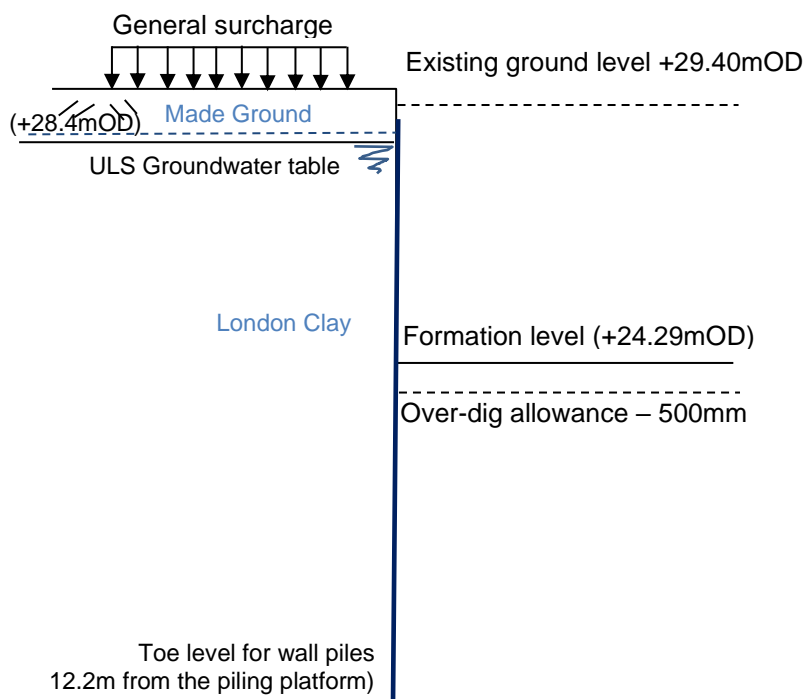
Sketch indicating the typical section for the contiguous piled wall
